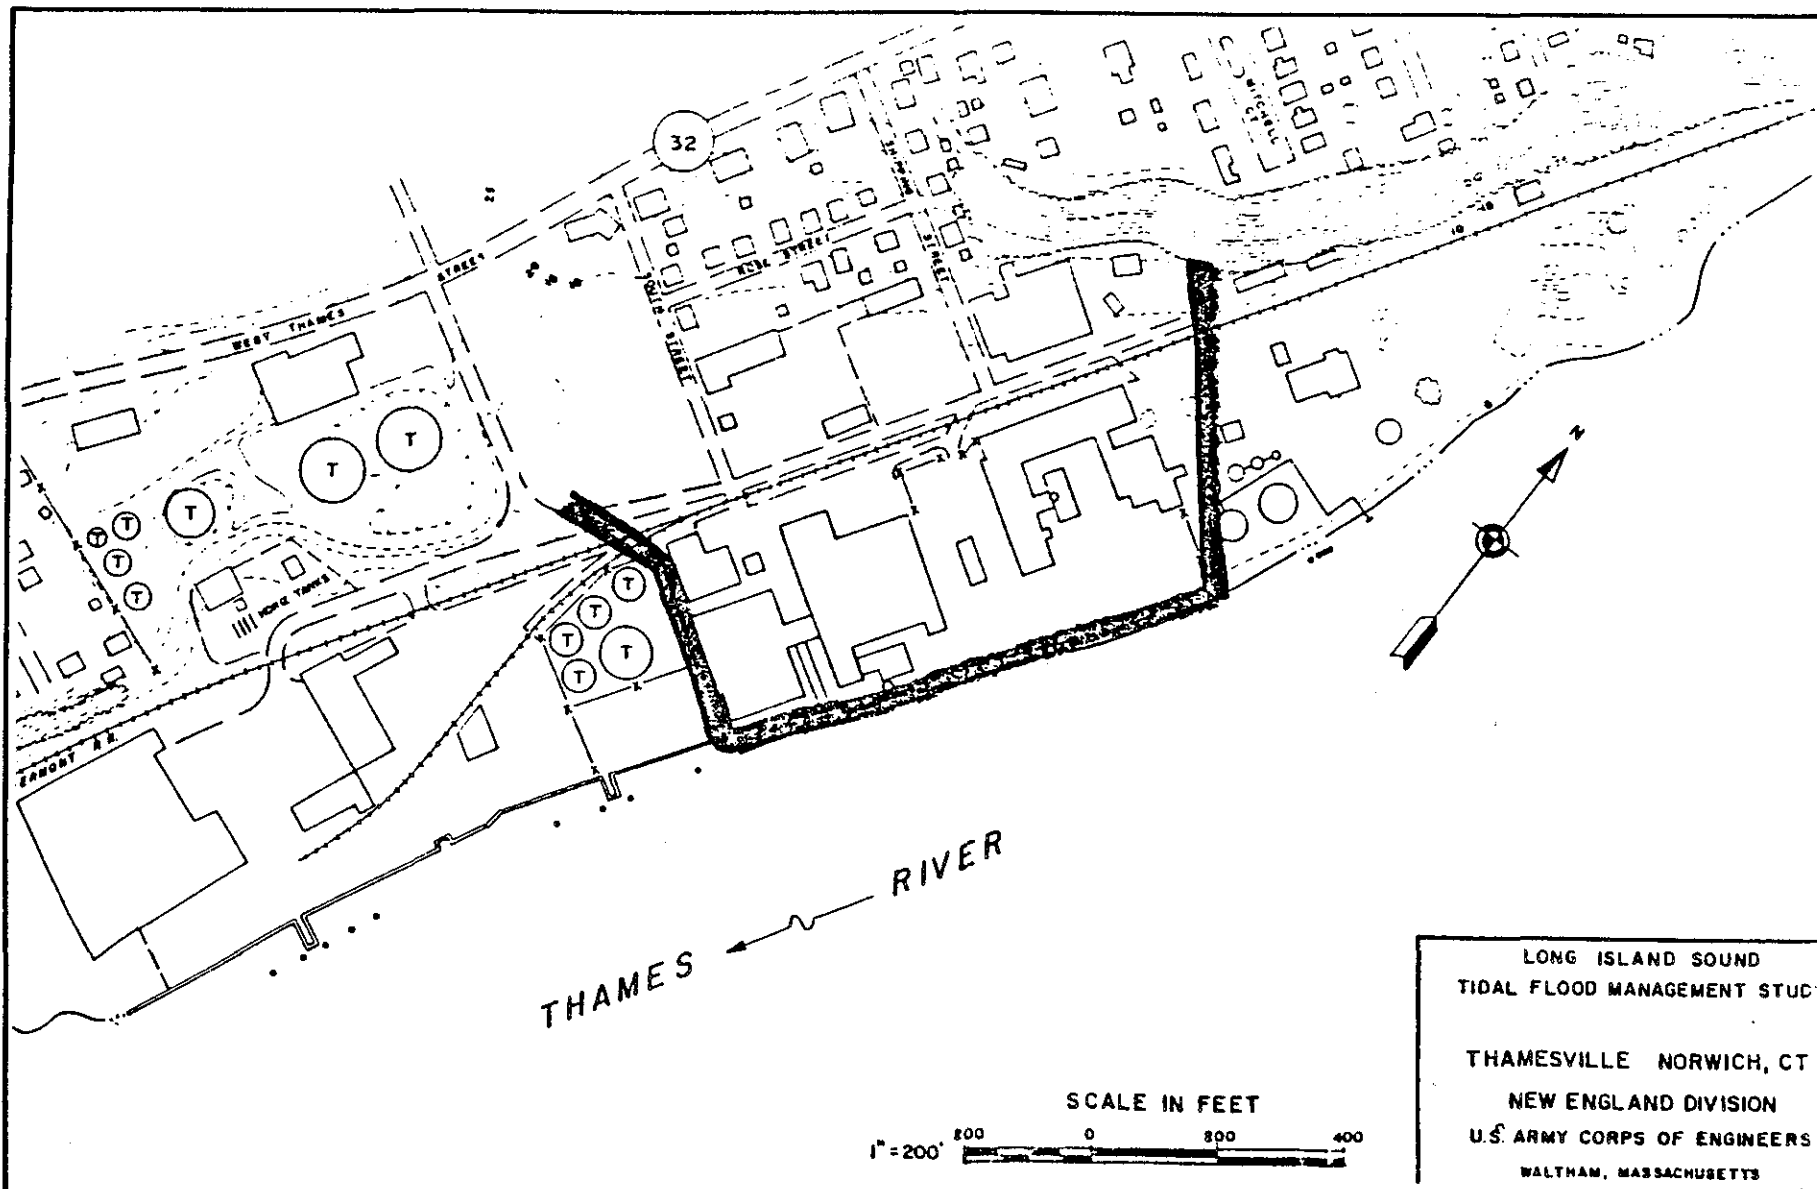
Alternative No. 3 - Floodwall (Waskiewicz, 1985)
